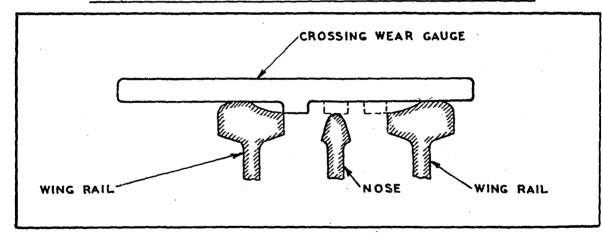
APPLICATION OF THE CROSSING WEAR GAUGE
